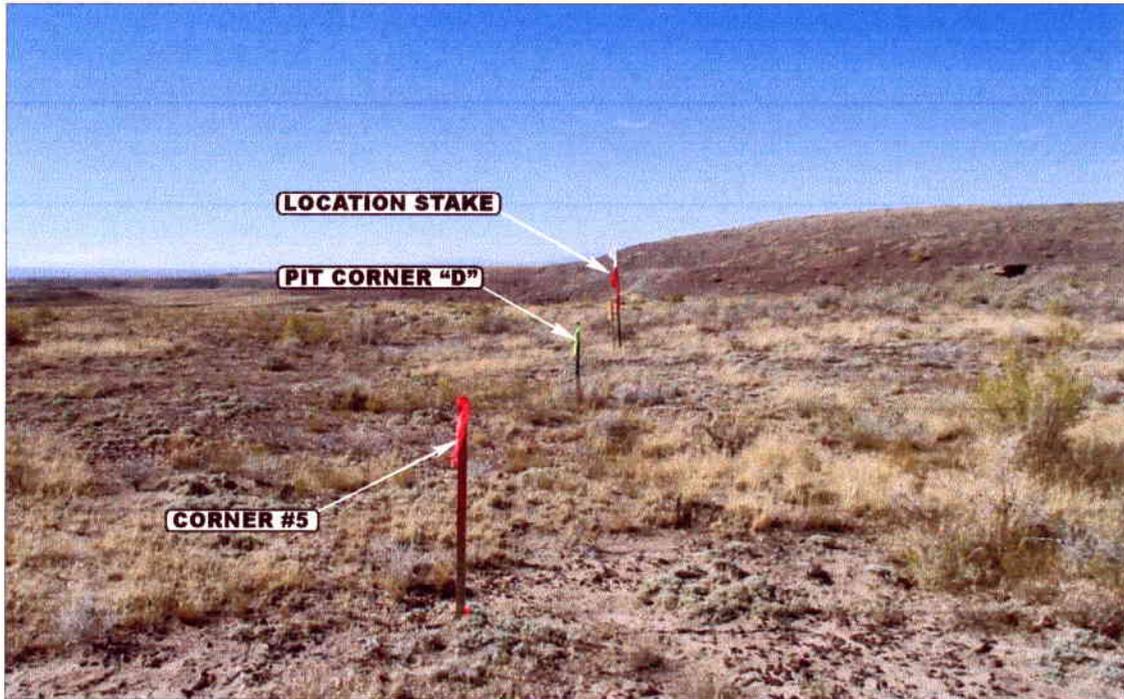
PHOTO: VIEW FROM CORNER #5 TO LOCATION STAKE
